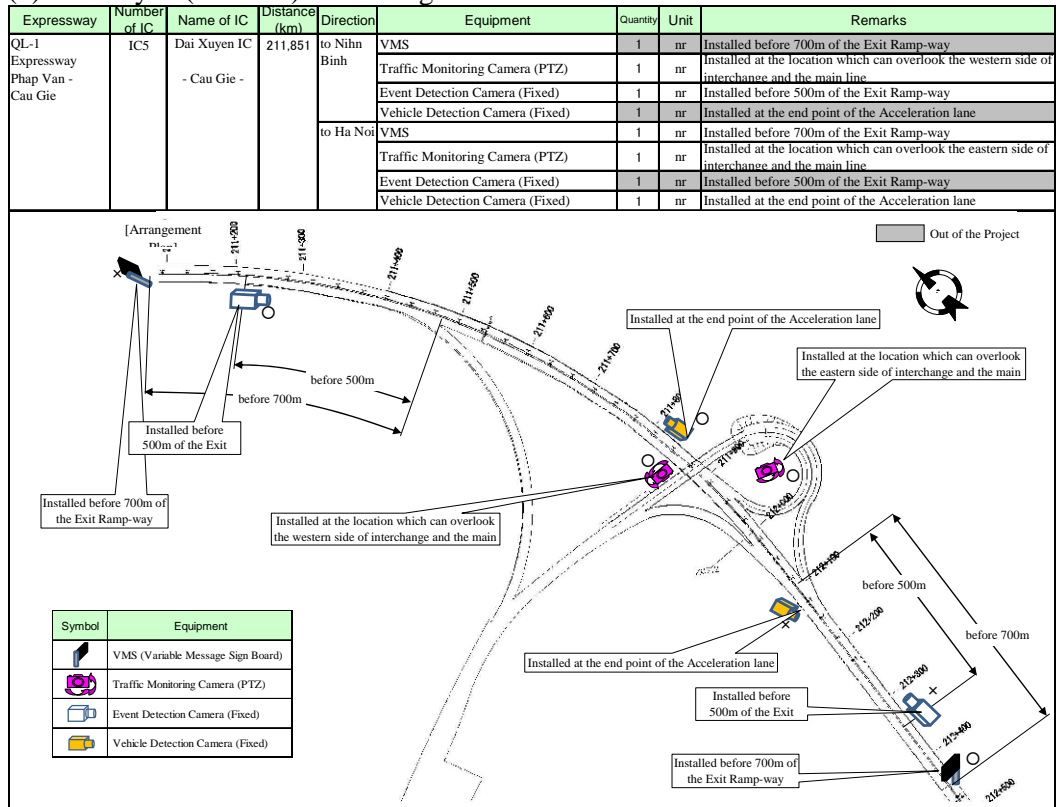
Equipment Layout Plan at Dai Xuyen (Cau Gie) Interchange
